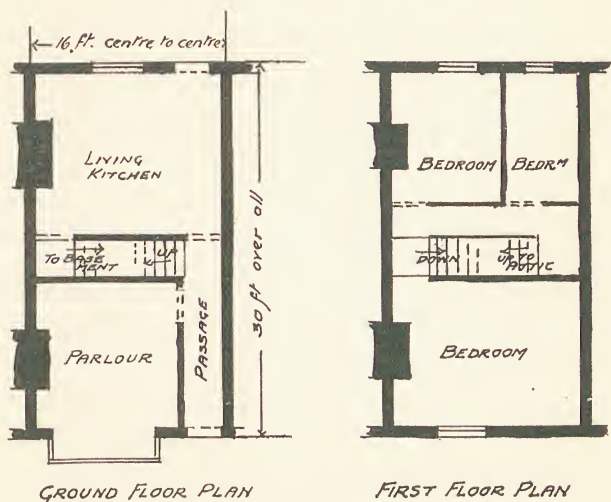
TYPICAL SMALL TERRACE HOUSE
